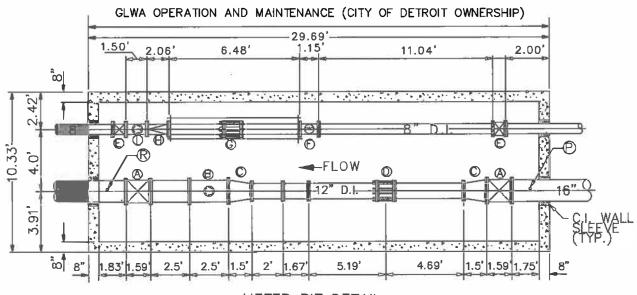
JOY ROAD & RIDGE ROAD PLYMOUTH TOWNSHIP
